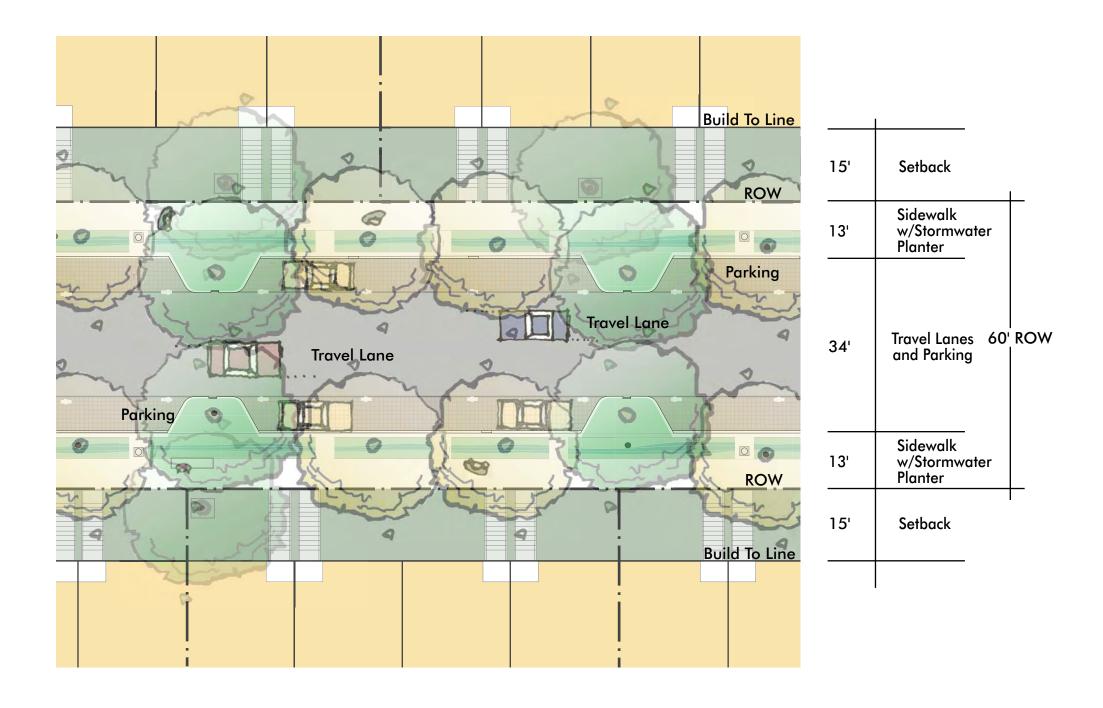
Dixieanne Avenue - Plan View Source: MIG
